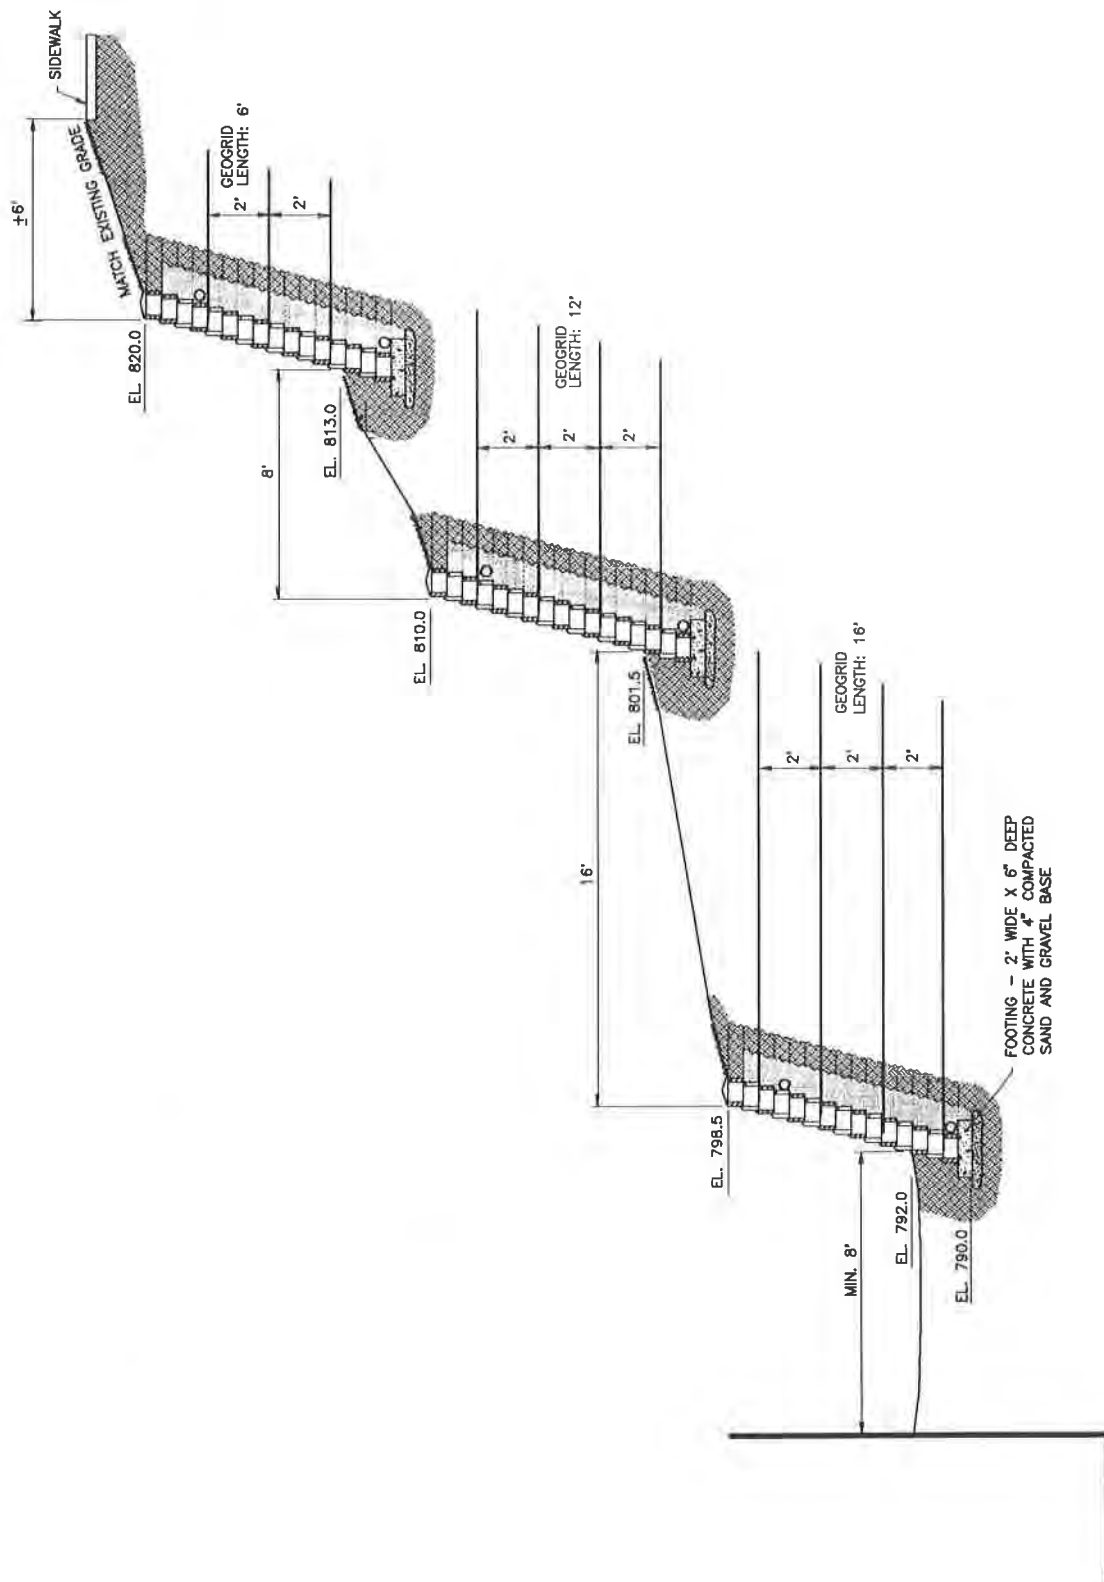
MODULAR MASONRY RETAINING WALLS WITH GEOGRID REINFORCEMENT
